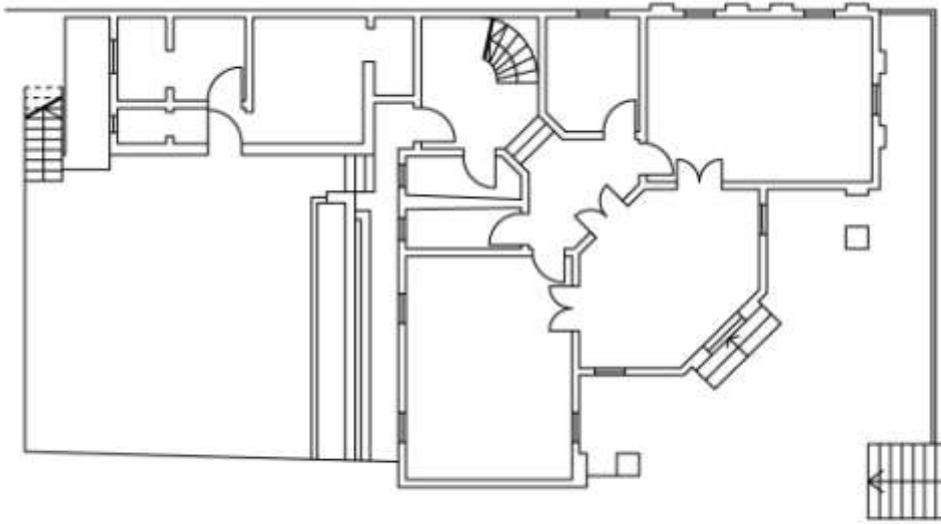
Ground (entrance) floor of the house at 151 lot 2 parcel
